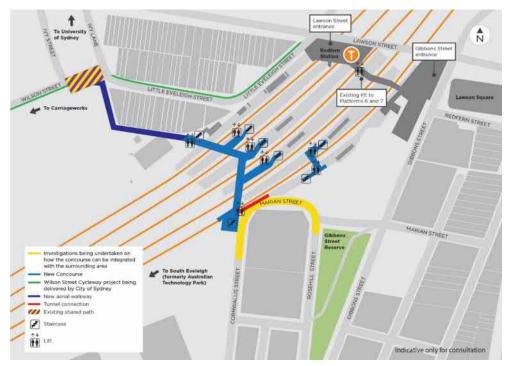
Option 4 - Cornwallis Street to Platform 1 concourse, with aerial walkway to Wilson Street. Secondary bridge linking Platforms 8-9 and 10
